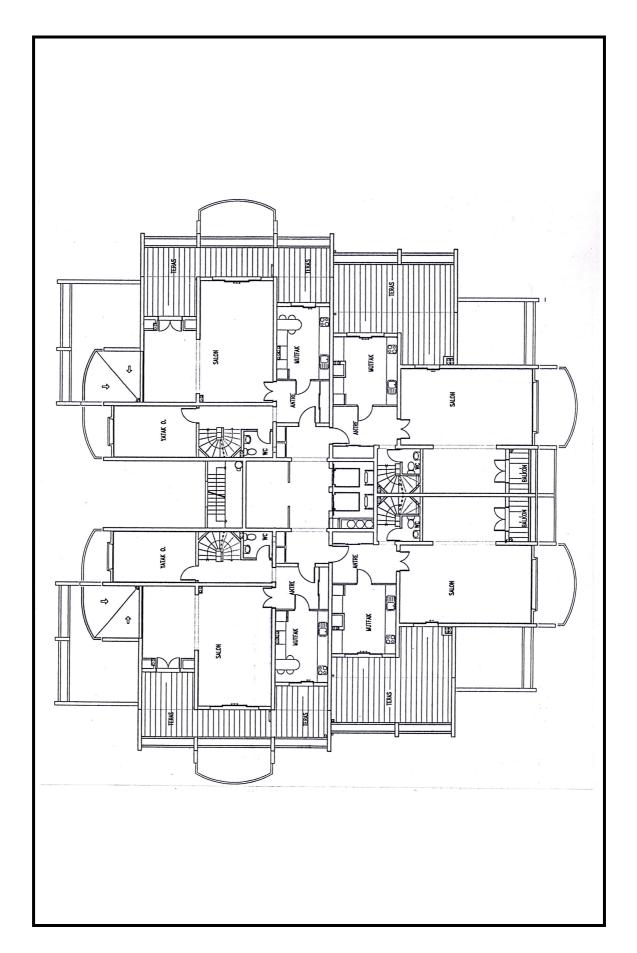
Mavişehir II; Albatros 20th-Floor Plan
